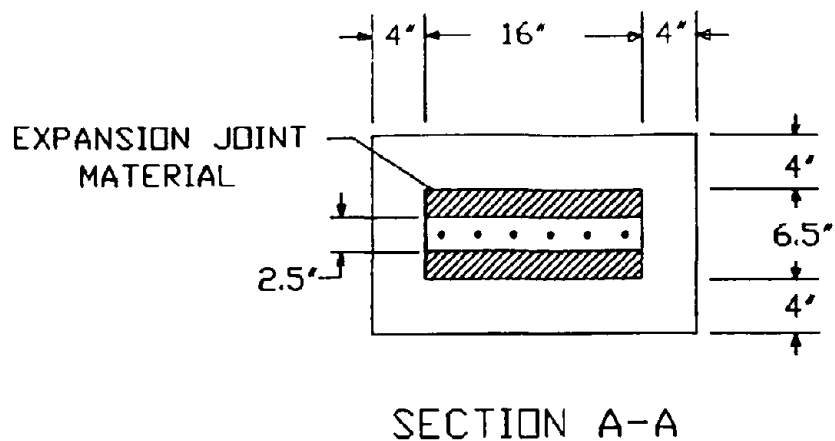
Typical Hinge Cross-Section and Elevation of SD-Series Test Specimens.
